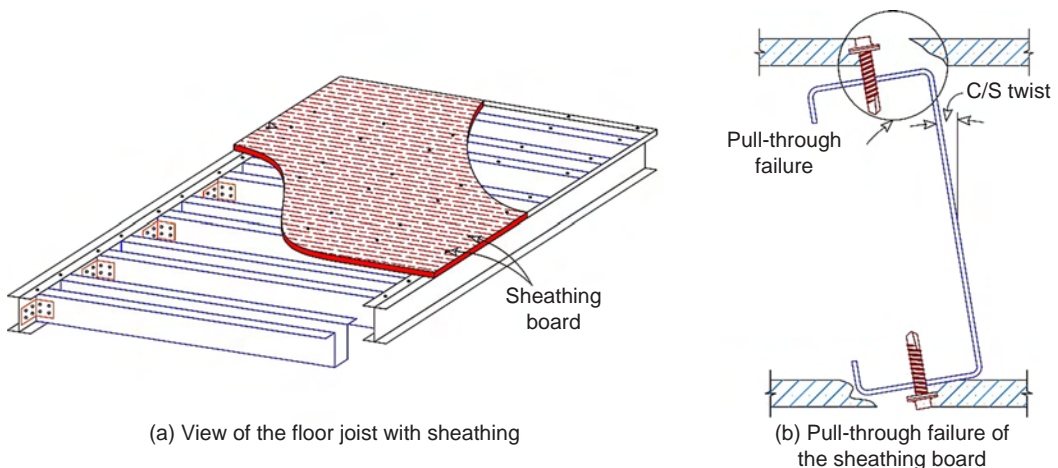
Stiffness of the sheathing boards in the floor joist panels
